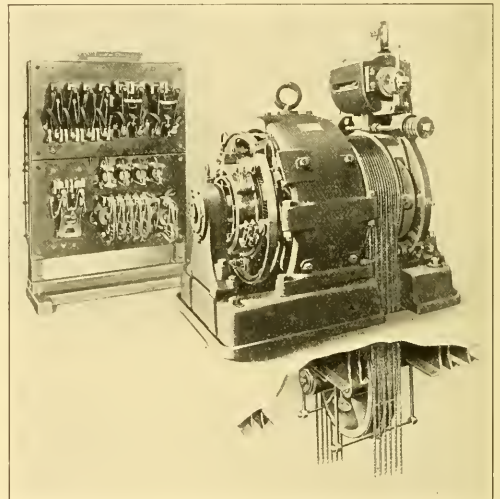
DETAIL VIEW OF THE OVERHEAD INSTALLATION OF A GEARLESS TRACTION ELECTRIC ELEVATOR
